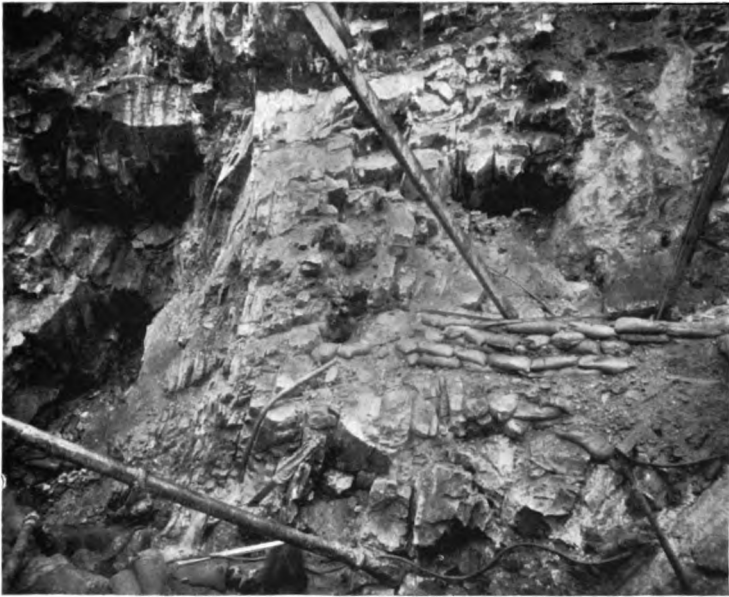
MARCH 2D, 1897. MAIN DAM ROCK EXCAVATION. UP-STREAM FACE.
